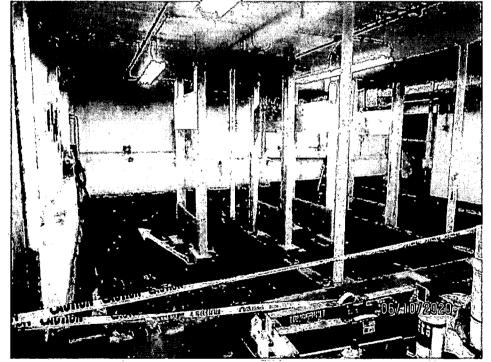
View of the ceramics room. Note the subfloor was demolished and temporary shoring installed. The northwest corner of the foundation is indicated with the red arrow.
